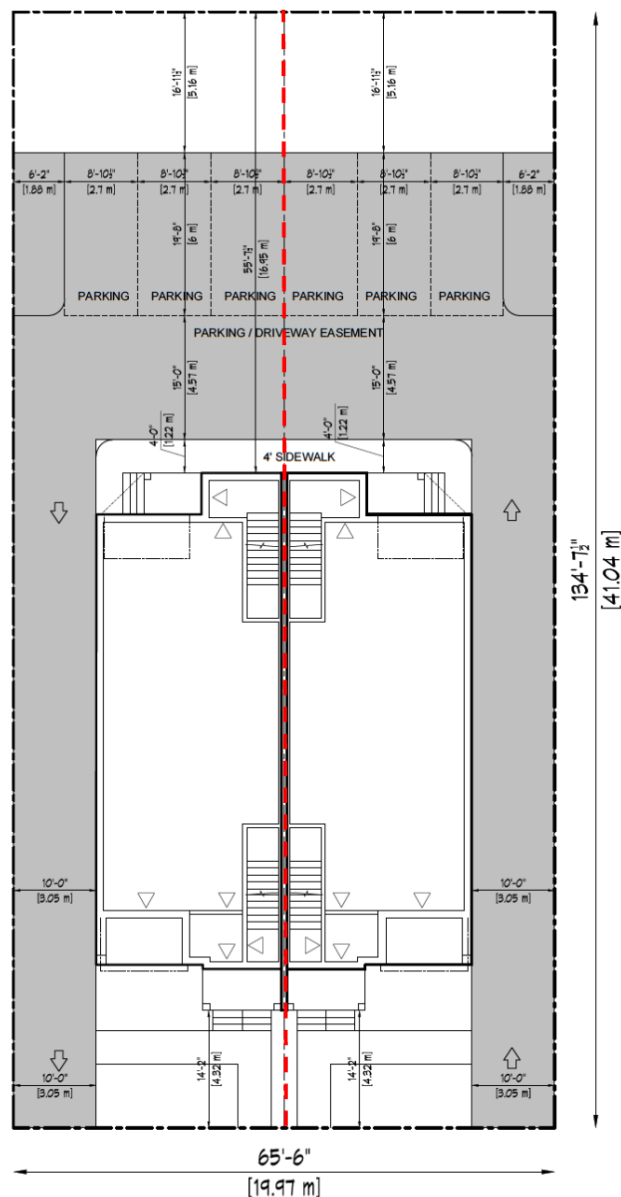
Site Plan of Subject Site with severance line shown in red and easement area shown in grey, prepared by Danlyn Design.
